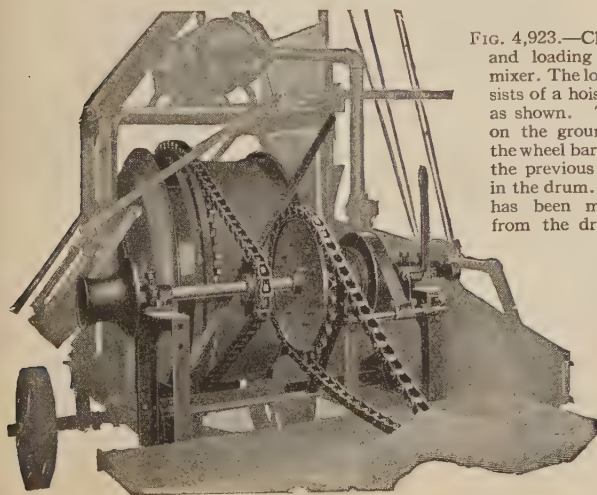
,923.—Chain drive for turning and loading drum of chain belt mixer. The loading mechanism consists of a hoisting drum and clutch as shown. The loader is charged on the ground level directly from the wheel barrows, being filled while the previous batch is being mixed in the drum. As soon as this batch has been mixed and discharged from the drum, the loader is elevated and another full batch emptied into the drum. The loader bucket is raised and lowered by means of a four part line. The cable used is three-eighths inch plow steel, six strands of 19 wires each attached to a hoisting drum operated by a wood friction clutch.
